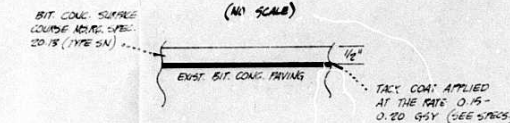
DETAIL OF PAVING FOR TRUCK PARKING AREAS (HEAVY DUTY)
